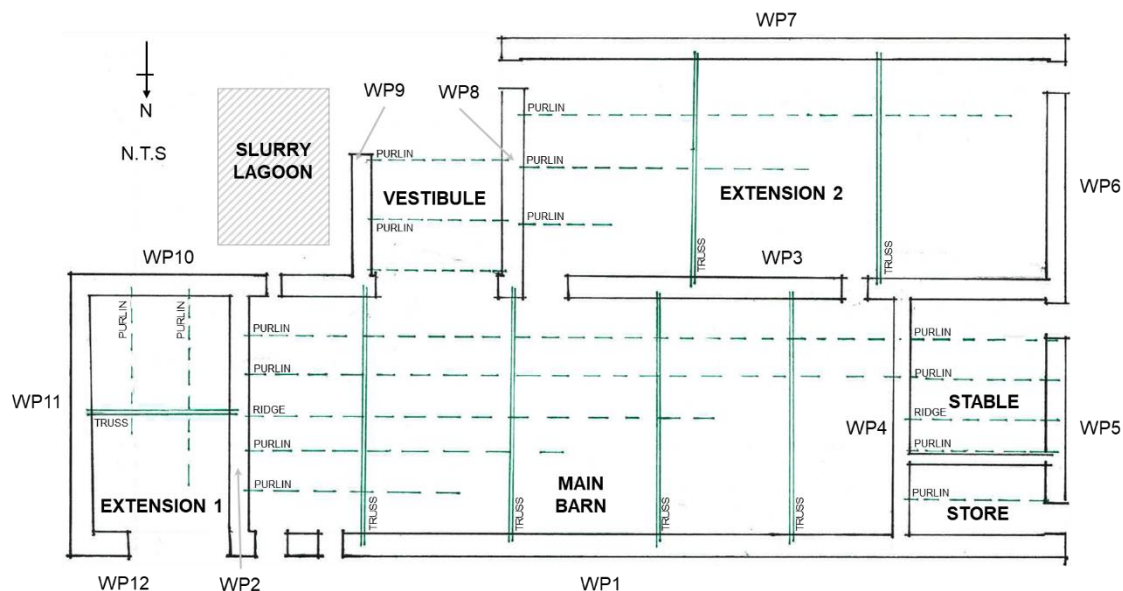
Site layout and nomenclature of the main barn and additional structures.
